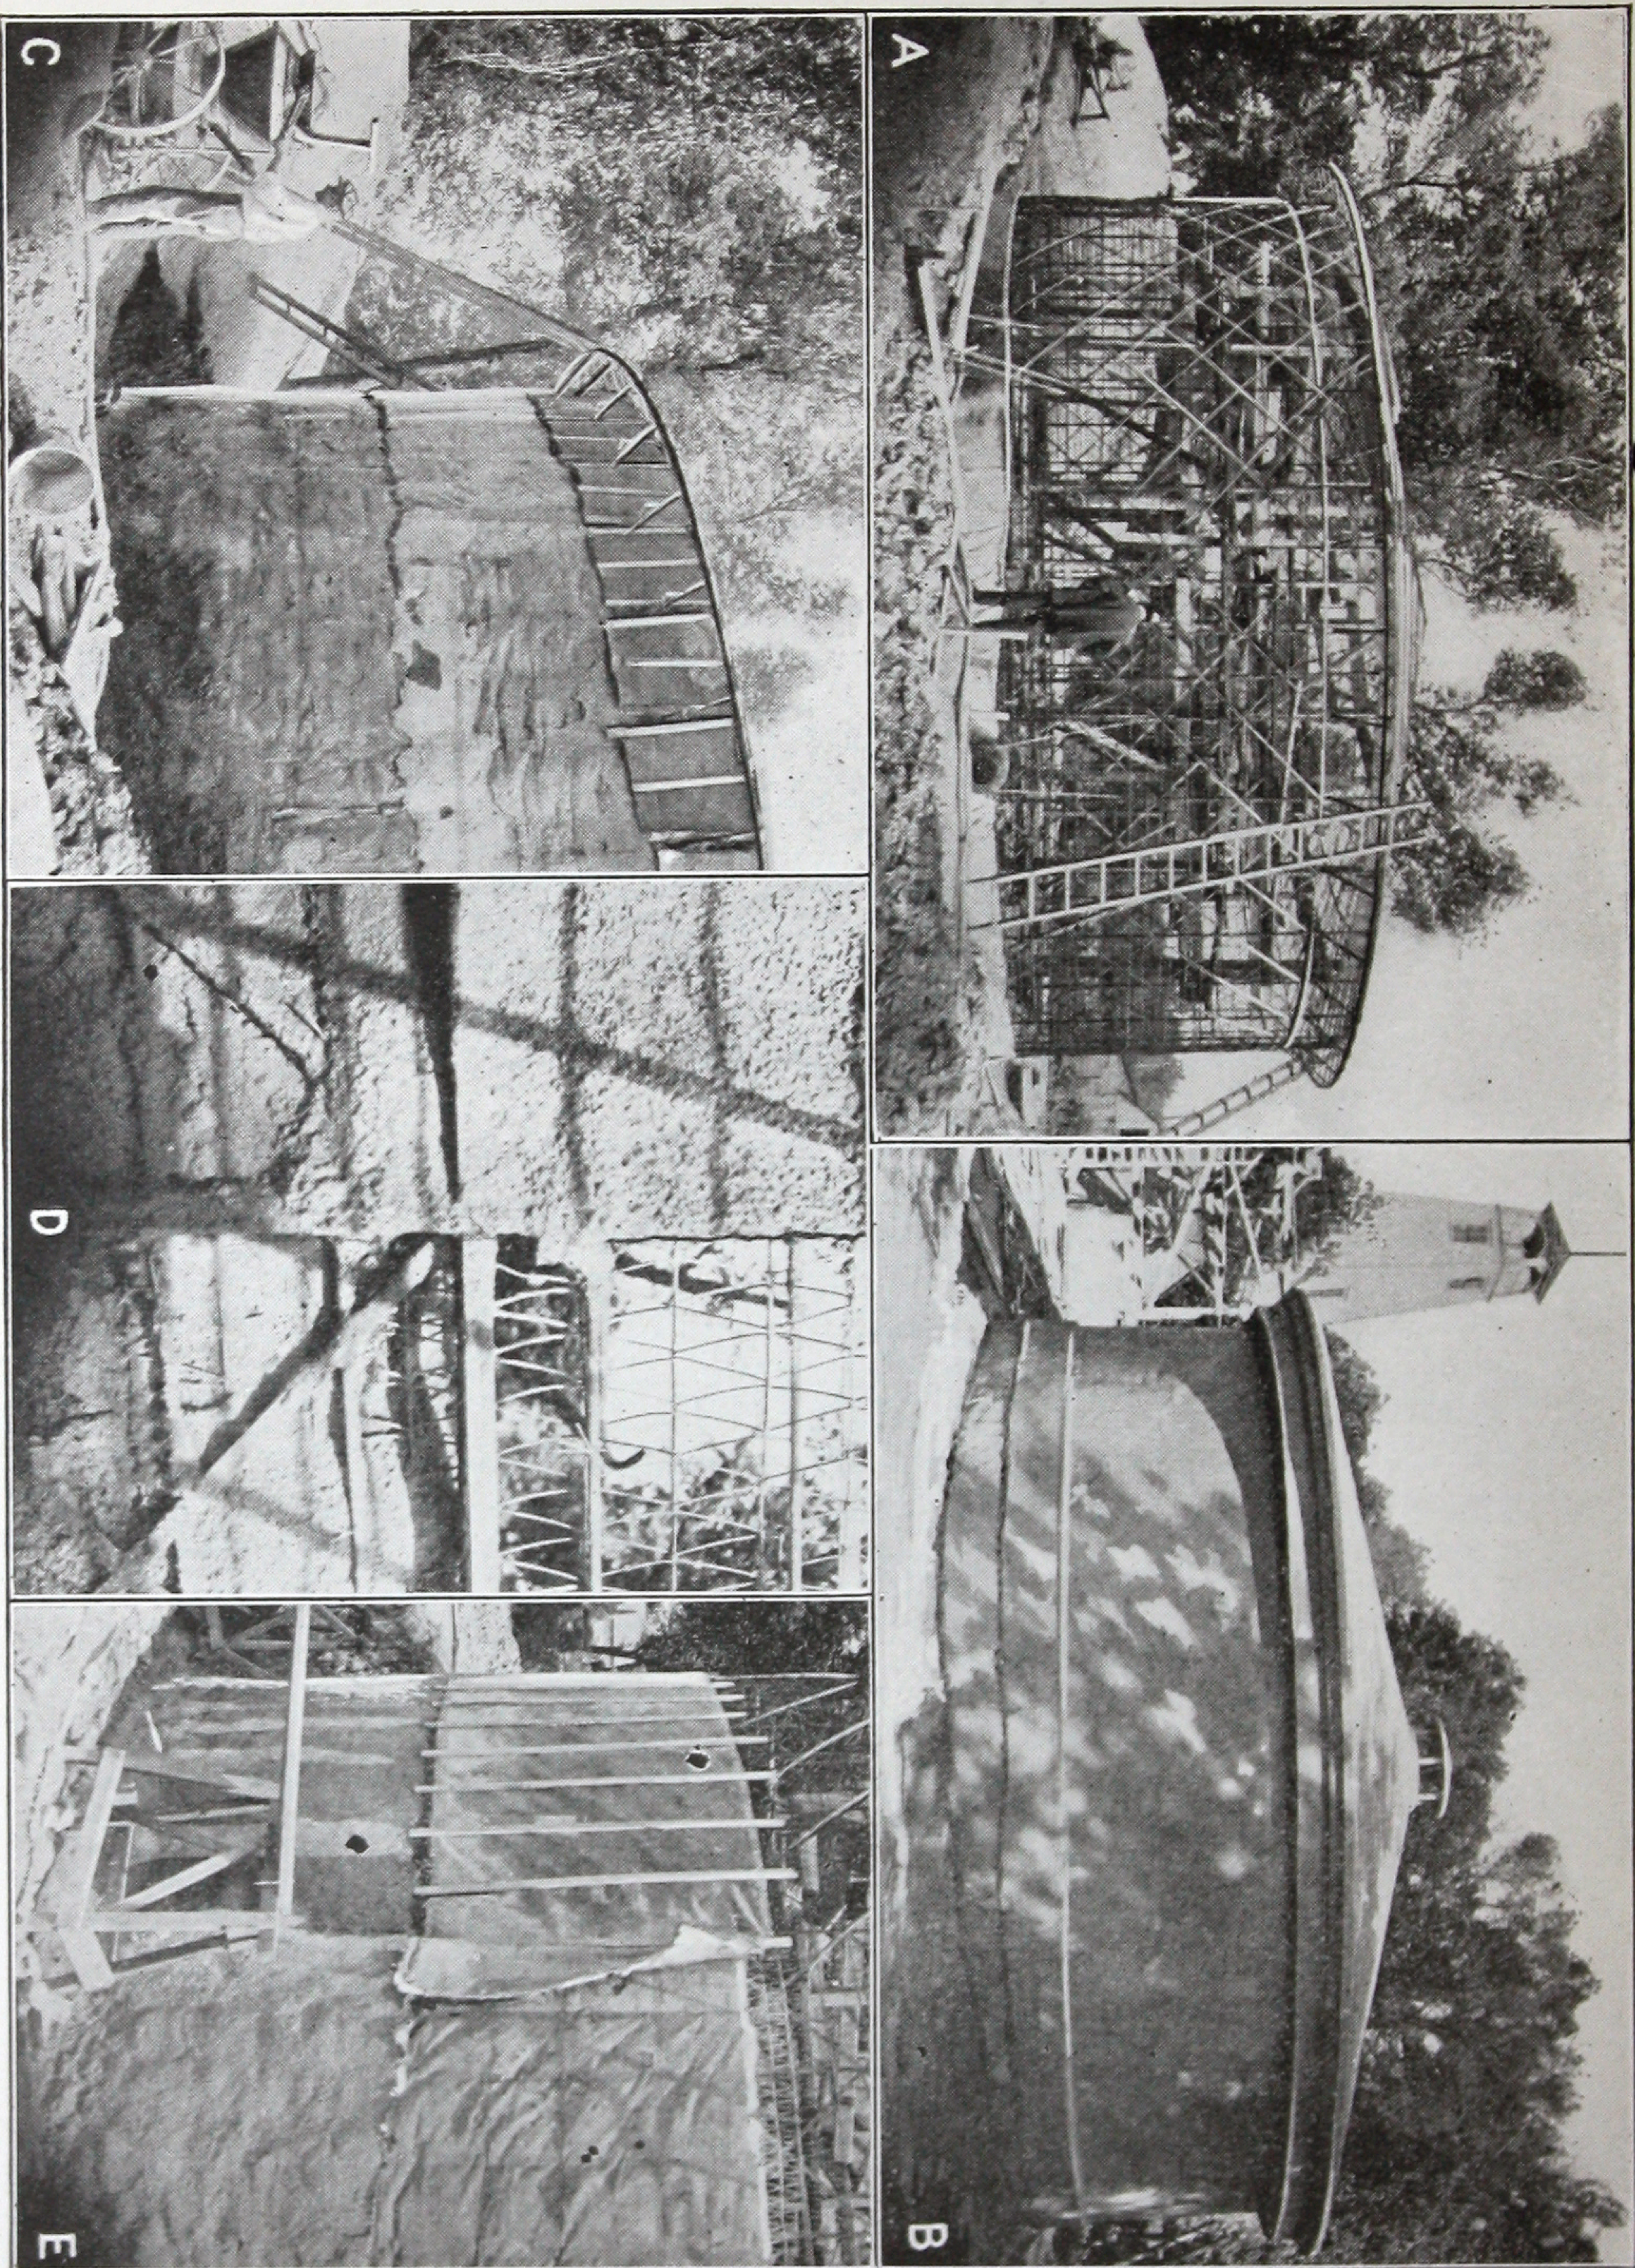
Building a Reinforced-Concrete Water Tank by the Cement Gun Without Using Forms; Elmhurst, Ill.
